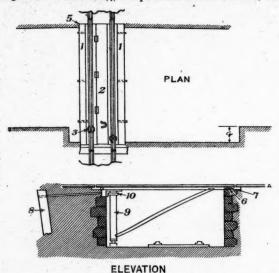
PLAN AND ELEVATION OF SWING BRIDGE.
